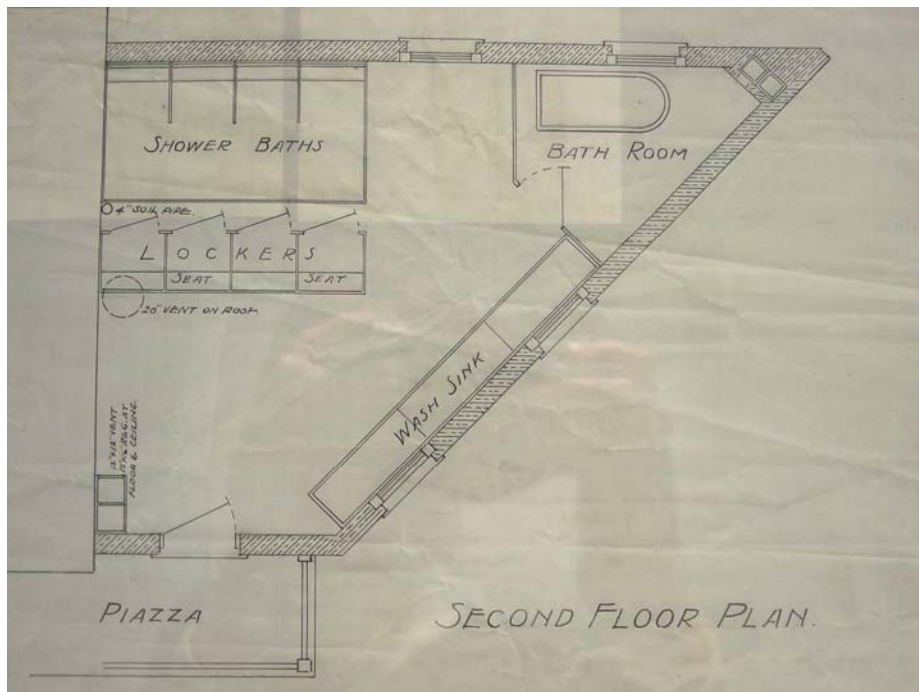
Details of proposed lavatory fixtures for the second story of the east addition to the north barrack, November 1898.
